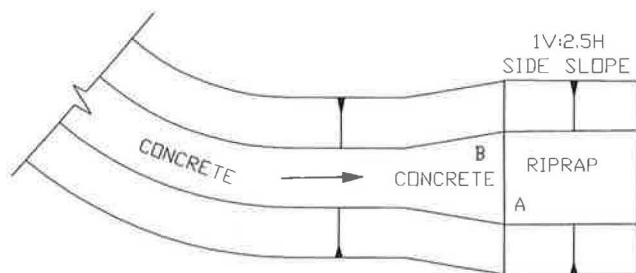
Plan view of channel in Example 4: (a) riprap failure, (b) sediment deposition.
